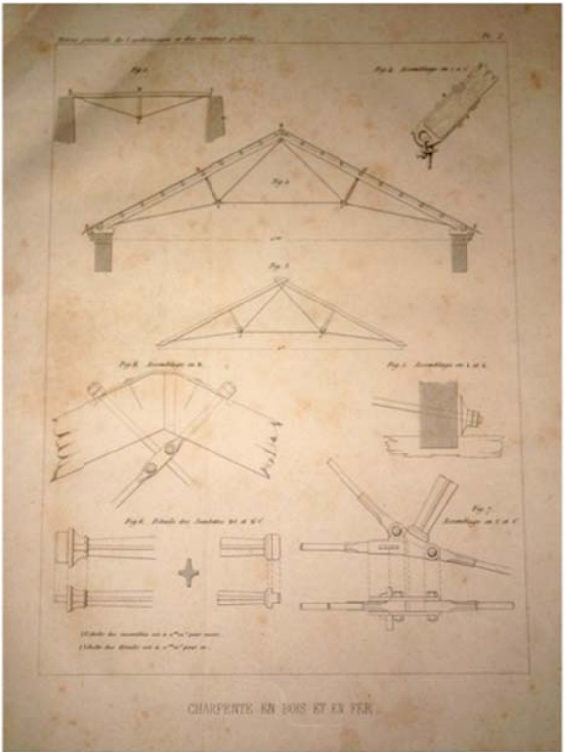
Designed for the Paris-Versailles Railroad in 1837, Polonceau published a monograph on the truss form under the title “Notice sur nouveau système de charpente en bois et fer,” (Revue Générale de l’Architecture et des Travaux Publics). This plate appeared in the original publication and details the adjustable connections at the ridge and rafter ends.
